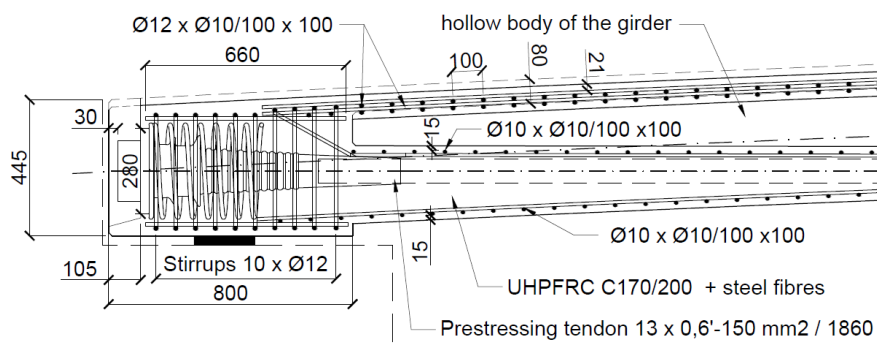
Longitudinal cross-section of the anchor head. Standard reinforcement together with steel fibres have been used in the whole deck.
